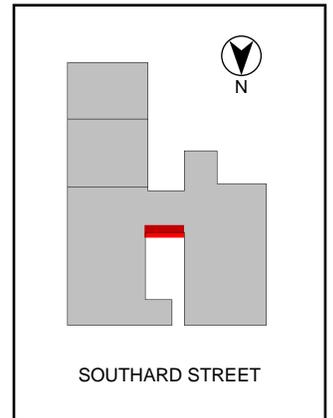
CONNECTING HYPHEN, FRONT ELEVATION
